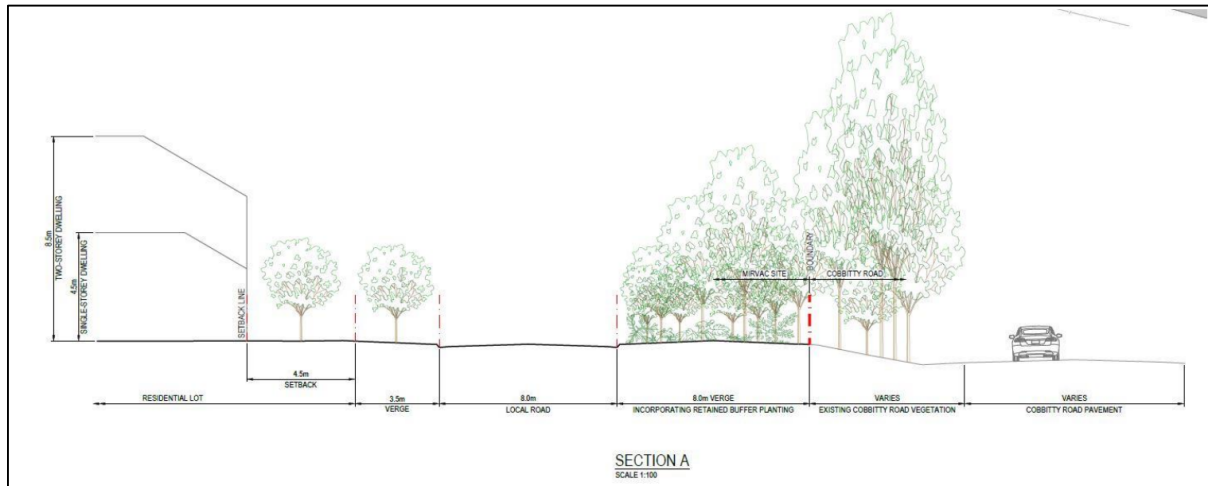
Cross Section of Cobbitty Road (existing Figure 28 in DCP)
